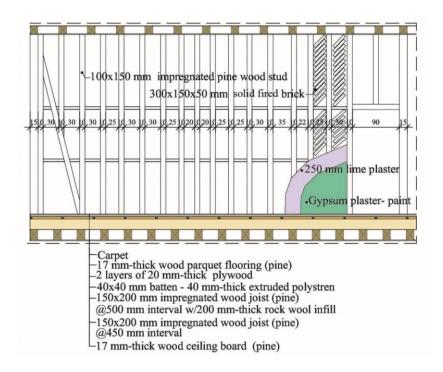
Elevation of Reconstructed-Wall 1 & section of Reconstructed-Floor 1 in 1/50 scale (Drawn by author).
